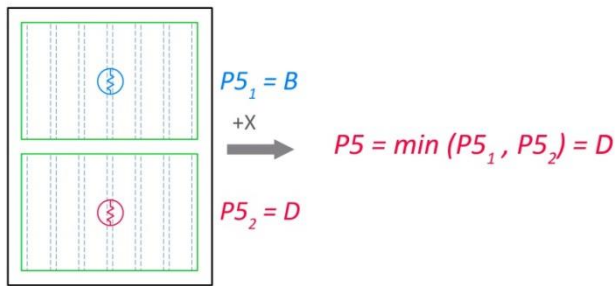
In the case of different types of horizontal diaphragms along the building, the worst class should be adopted (plan view)
